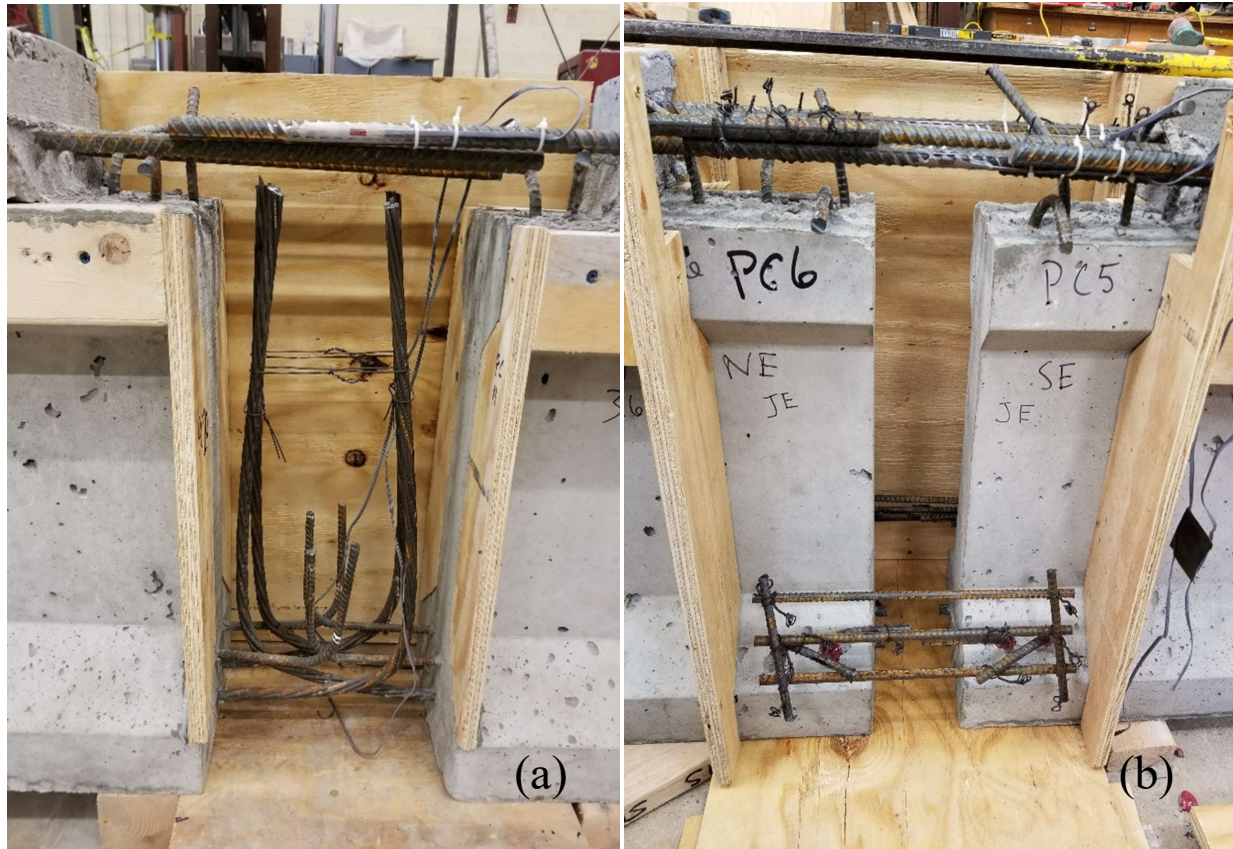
Newly constructed joint (a) and retrofit continuity joint (b).
